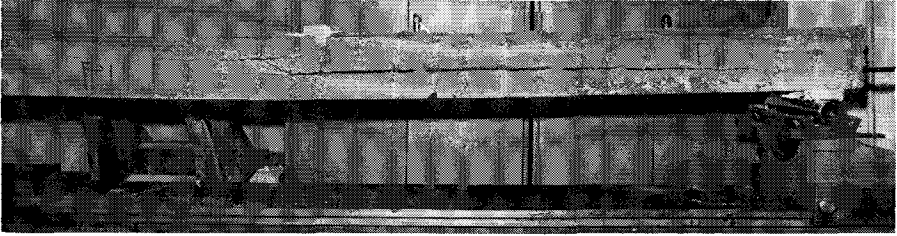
Weak horizontal "cold" joint in sulfur concrete beam.
